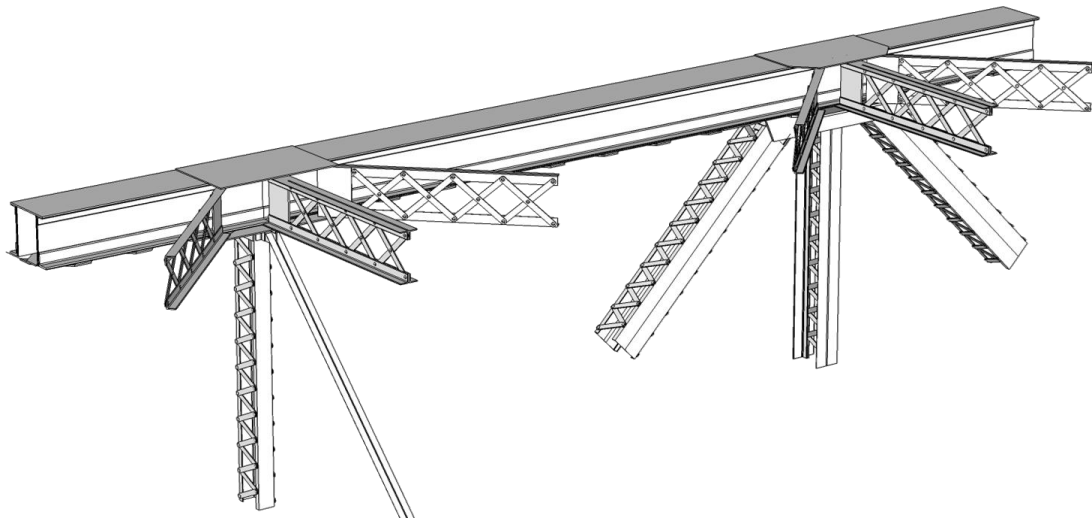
Detailed 3D SketchUp Model Developed for a Study on the Connection Details
